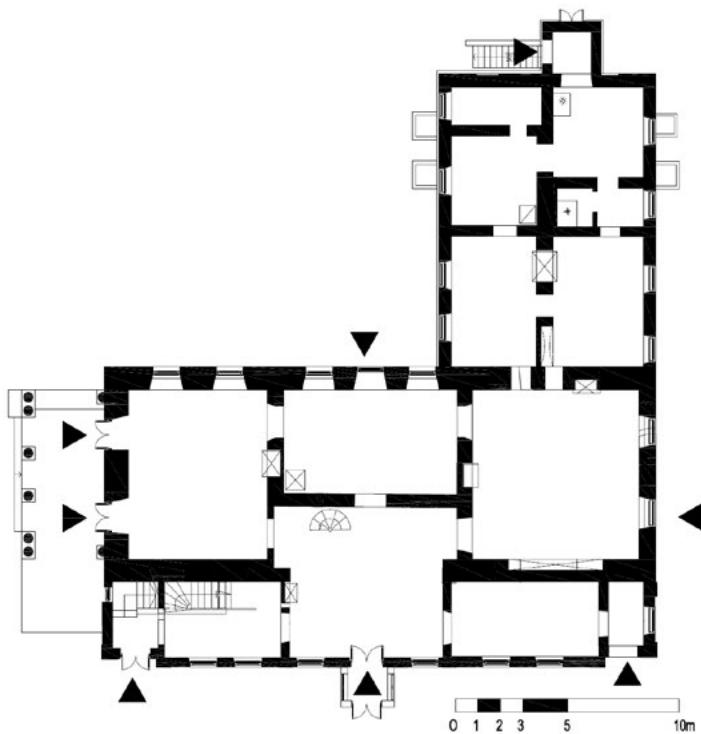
Ground floor plan – reconstruction of the building undergoing transformation into a court, Fig. K. Janus
